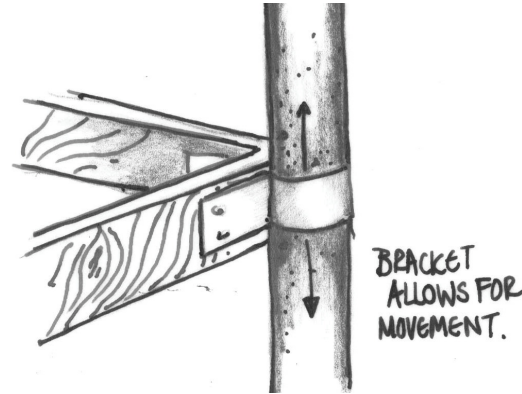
Example of a connection between the timber and concrete. Sketch by Author 2011
